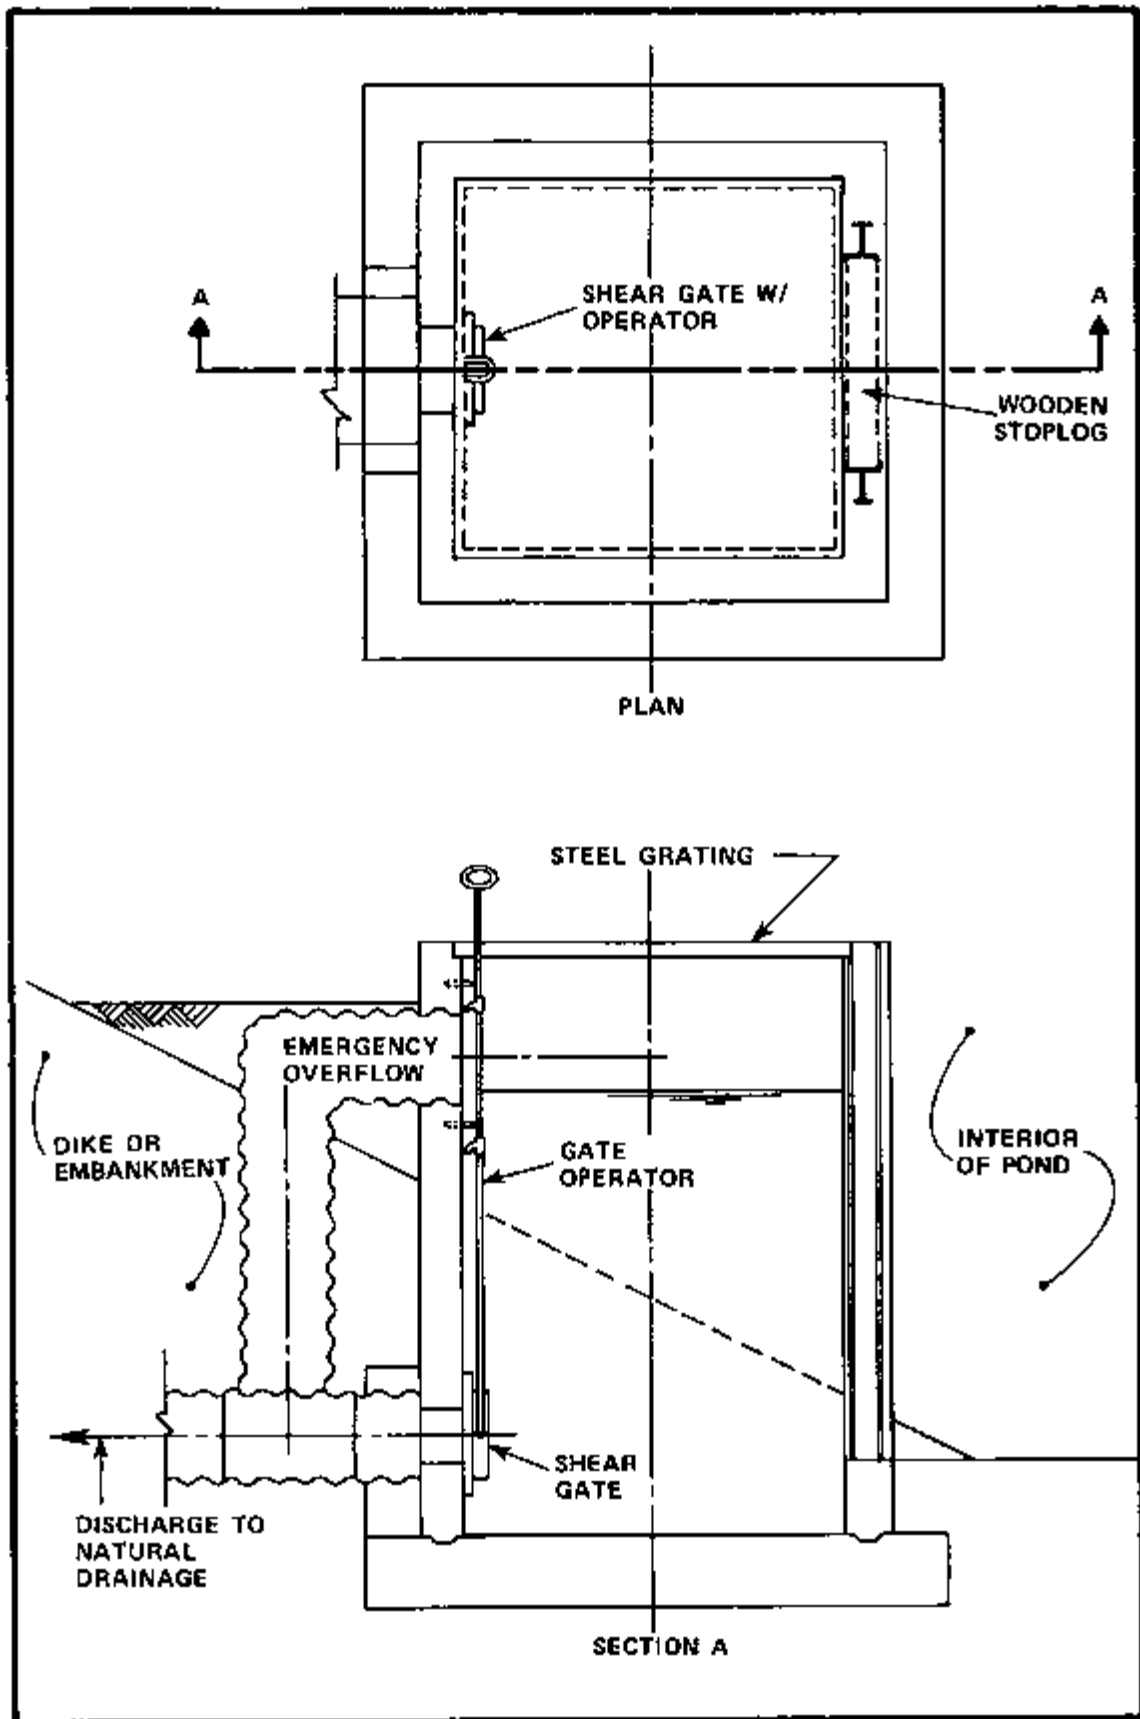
CONSTRUCTION RUNOFF POND OUTFALL STRUCTURE.
